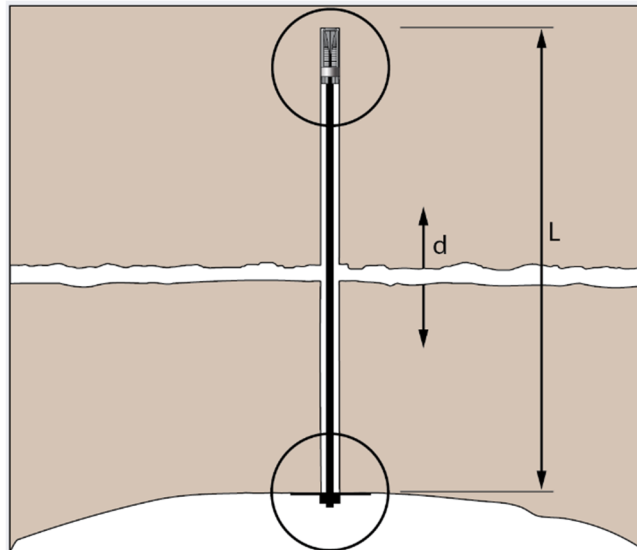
Schematic showing the point anchor principle where the bolt is bonded to the rock only at the toe and collar of the bolt (after Potvin & Hadjigeorgiou 2020)
